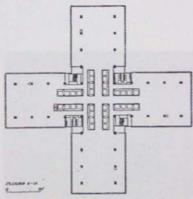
Typical plan, floors 8-13, Place Ville-Marie.
